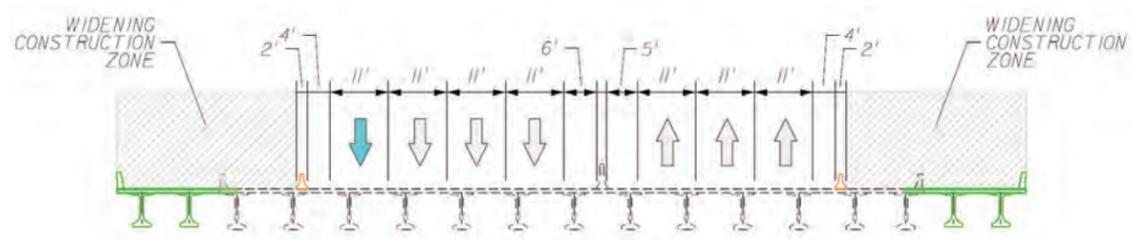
Bridge Over SW 56th Street/Miller Drive - Outside Widening
